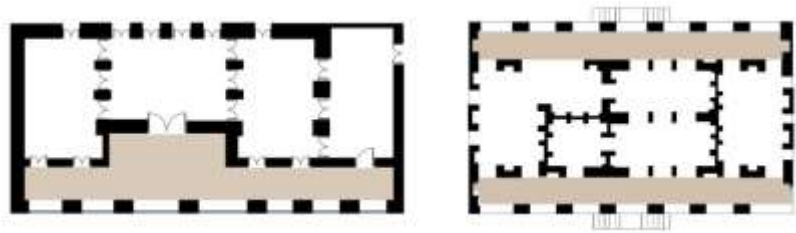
Examples of a one-sided and two-sided porch. Left: the plan of the eastern house of Afghan-nezhad house, right: the plan of Haj Mahdi Sultan House
